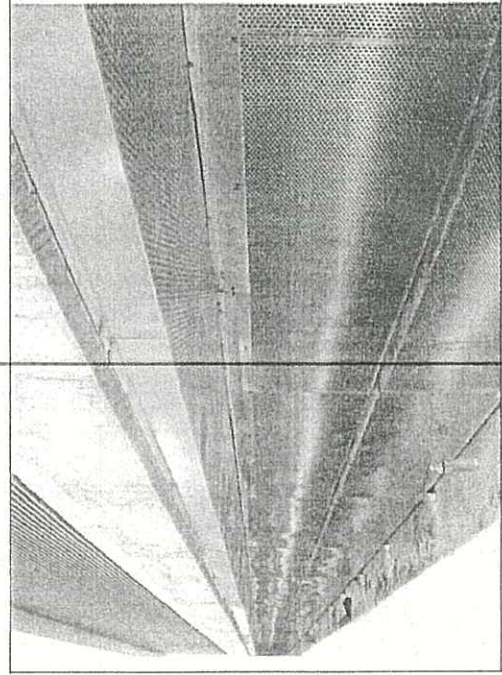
Noise Acoustic Panel Underside of Station Walkway at LOP
